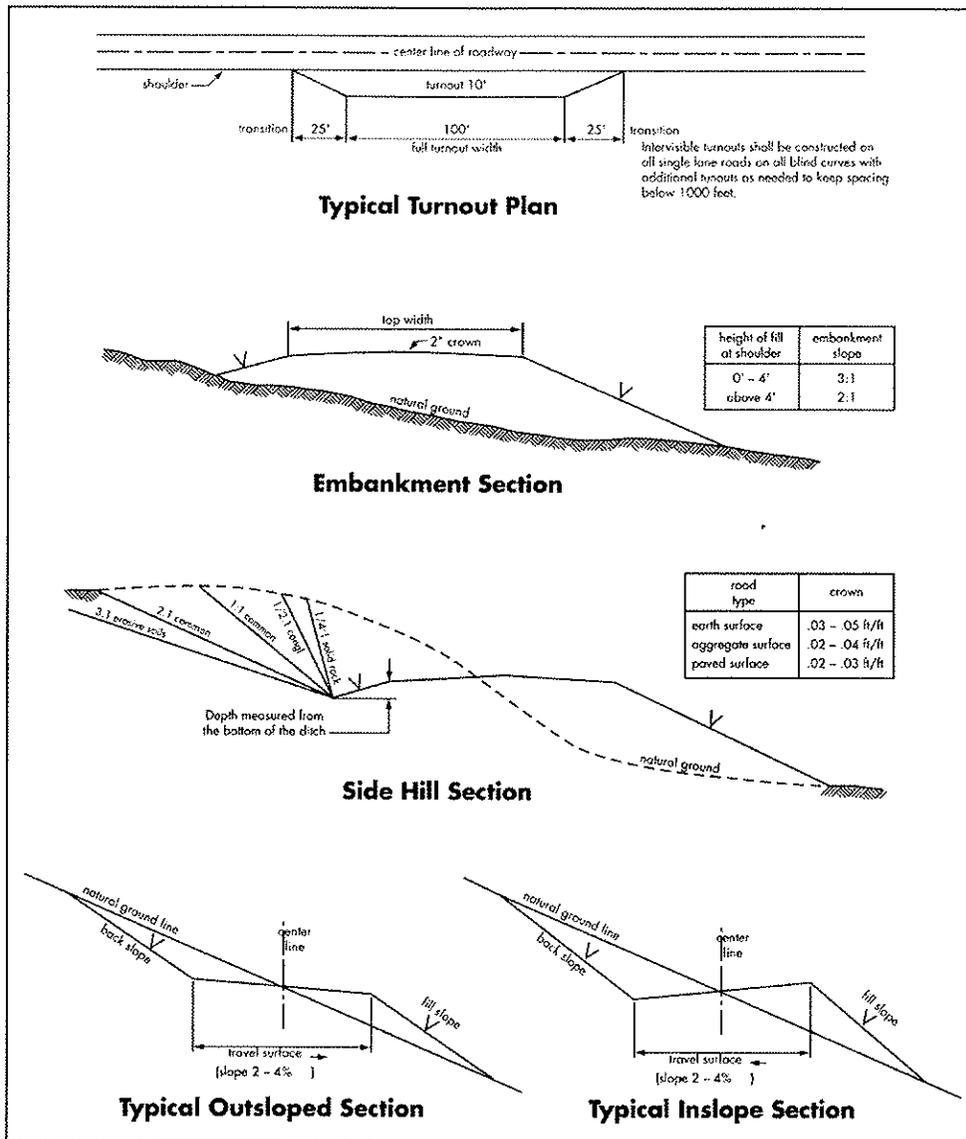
Typical road cross sections (BLM & USFS, 2007)
